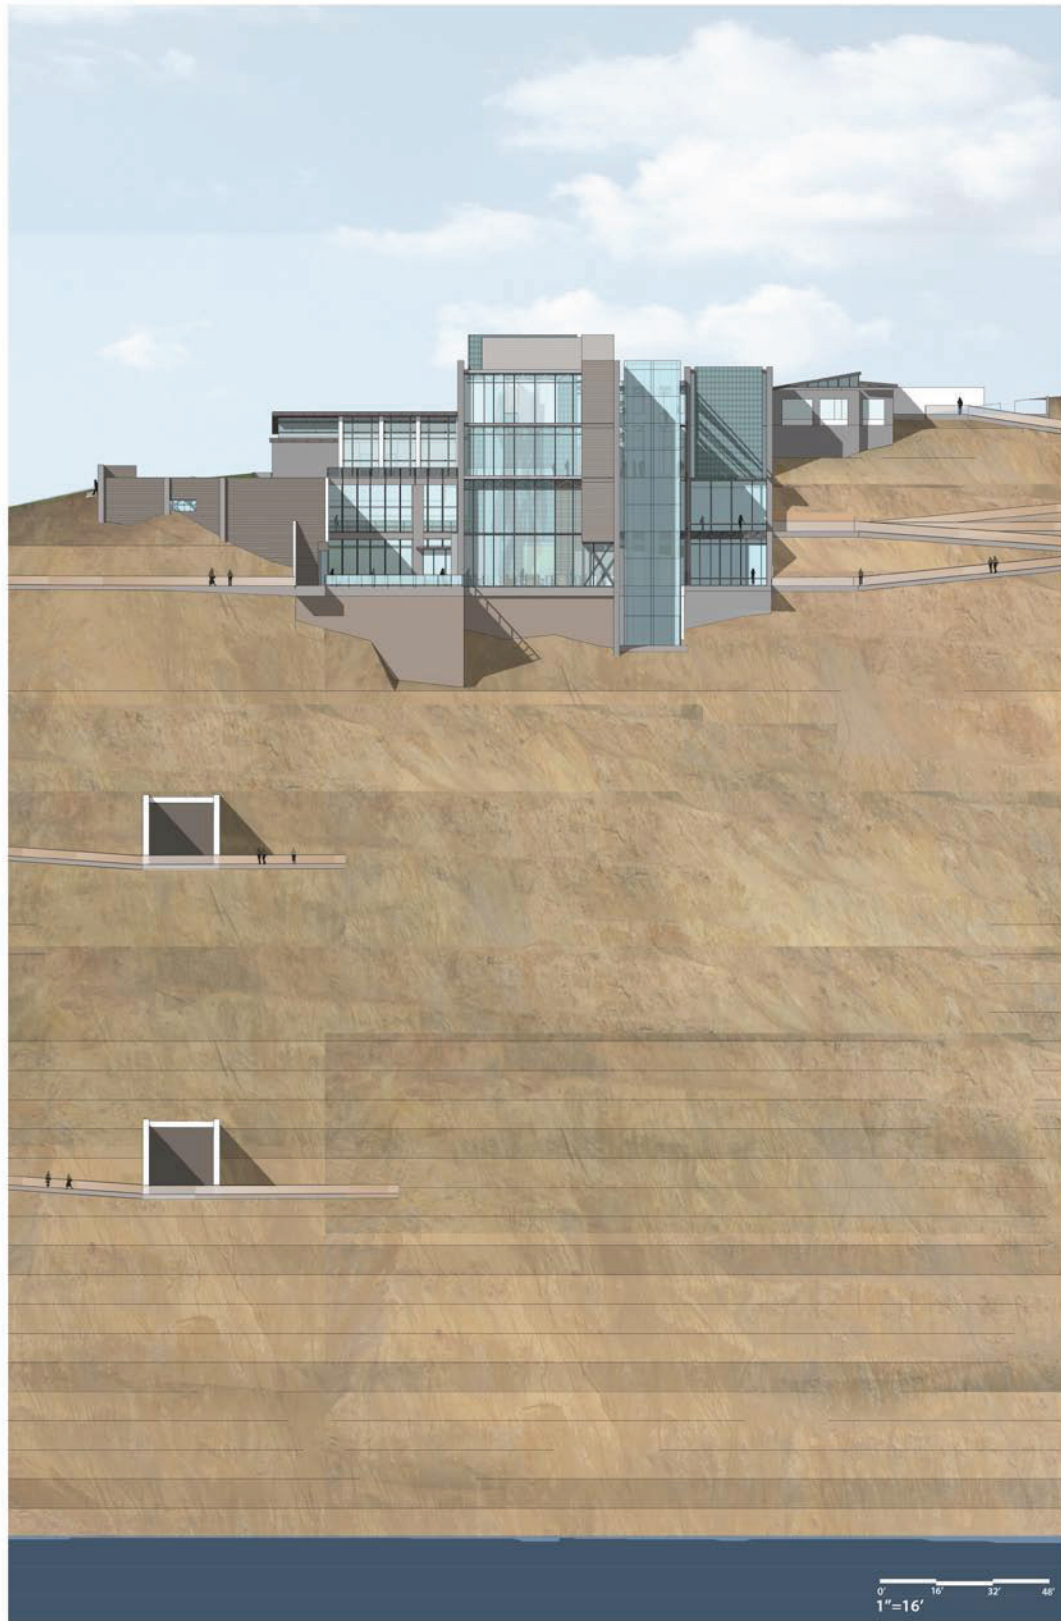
Building Elevation, Eastern Facade [Drawing by Emily Childs]
